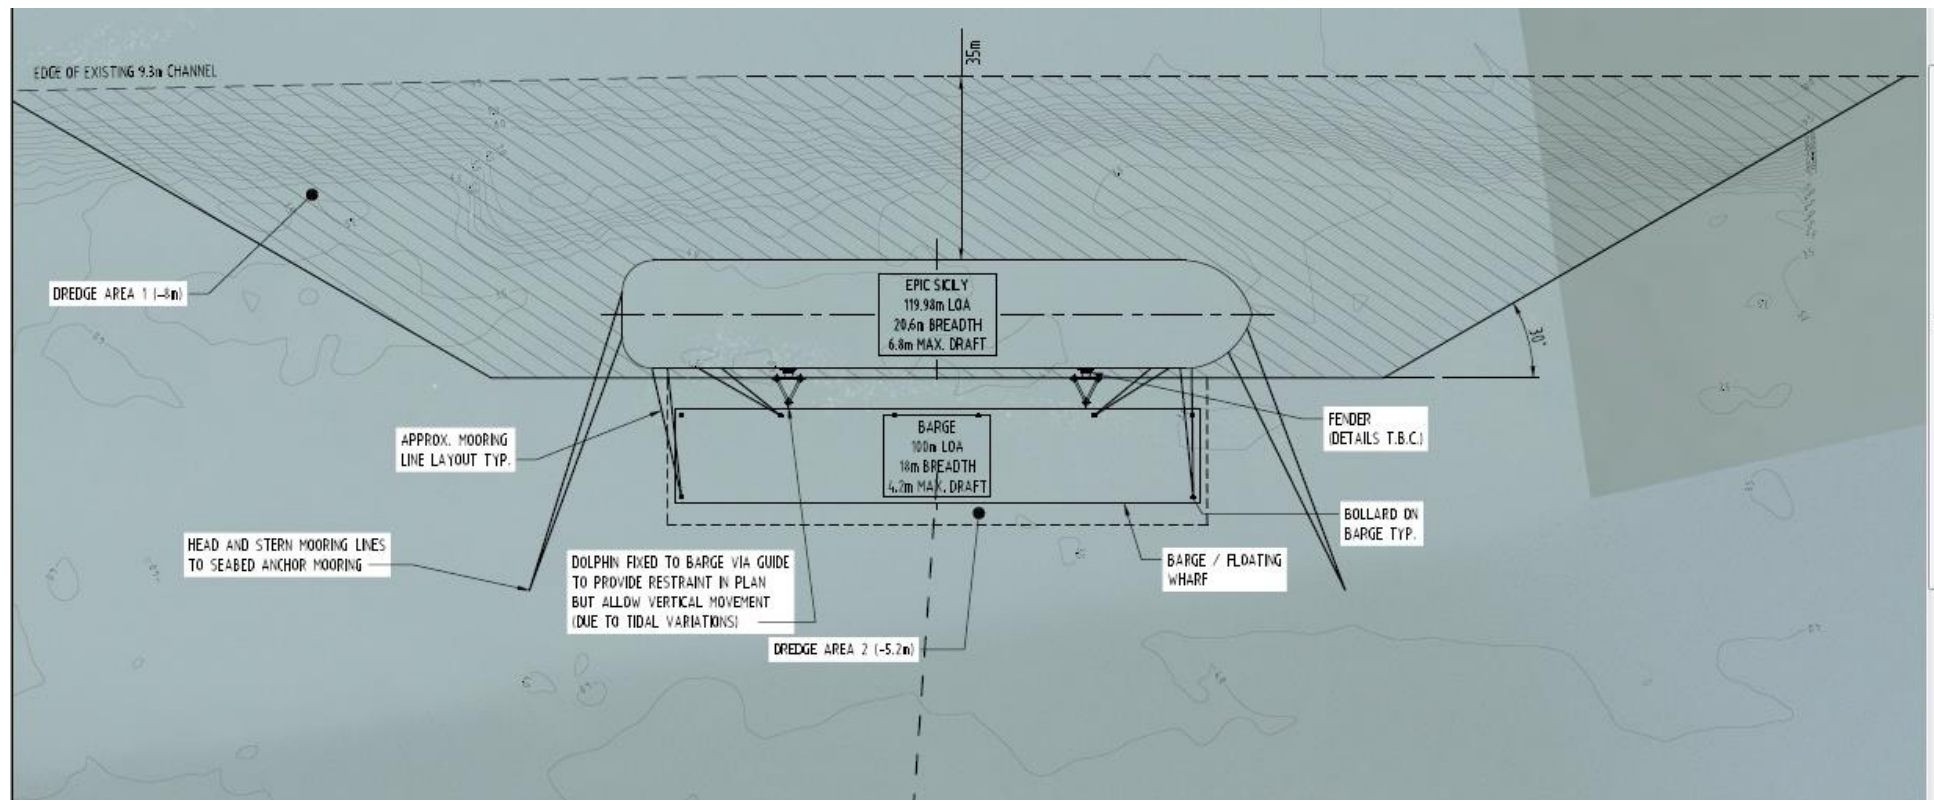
Dredge area and mooring dolphin concept design (provided by Wallbridge Gilbert Aztec)
